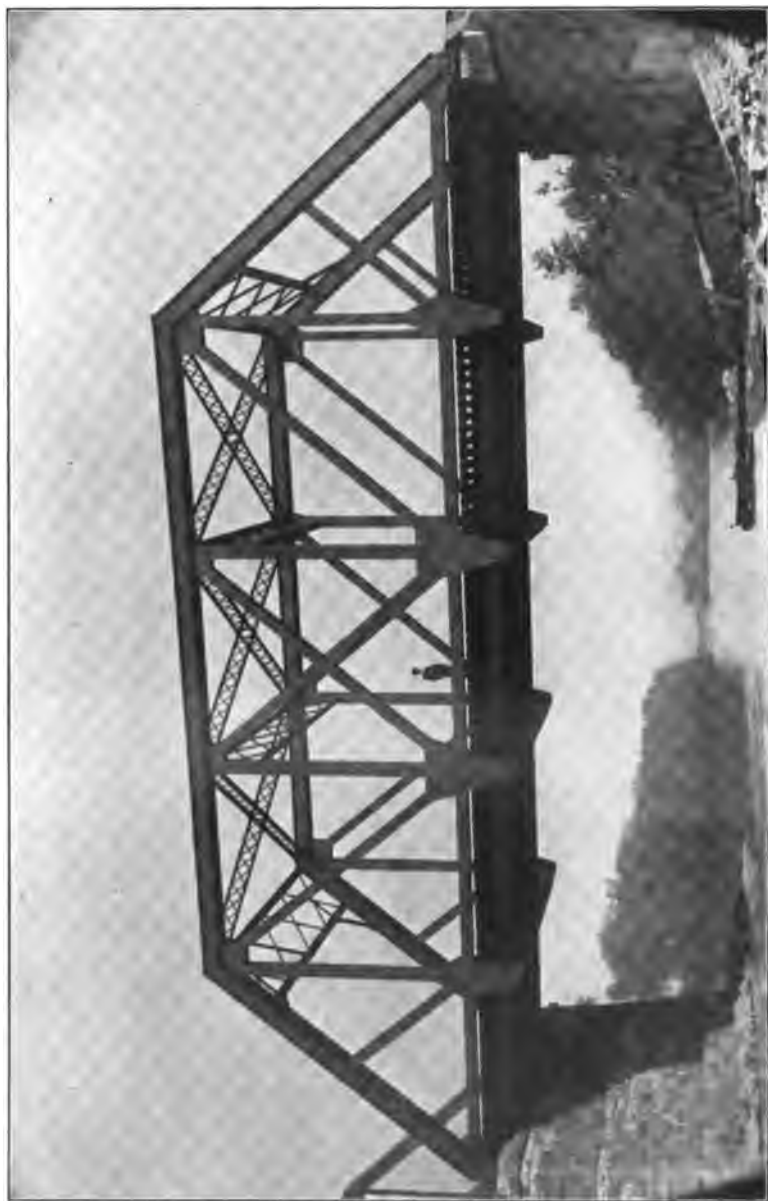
Central Railroad of New Jersey Bridge over Lehigh River at Allentown, Pa. Built in 1903.
